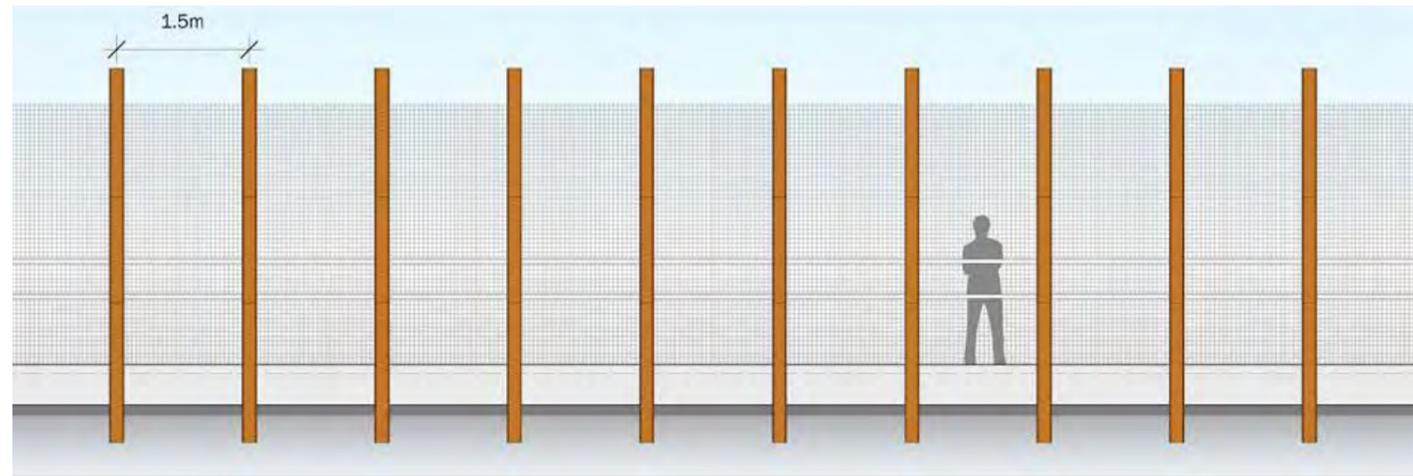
Pedestrian bridge over Mount Ousley Road BR02 - Elevation (Scale 1:80)
